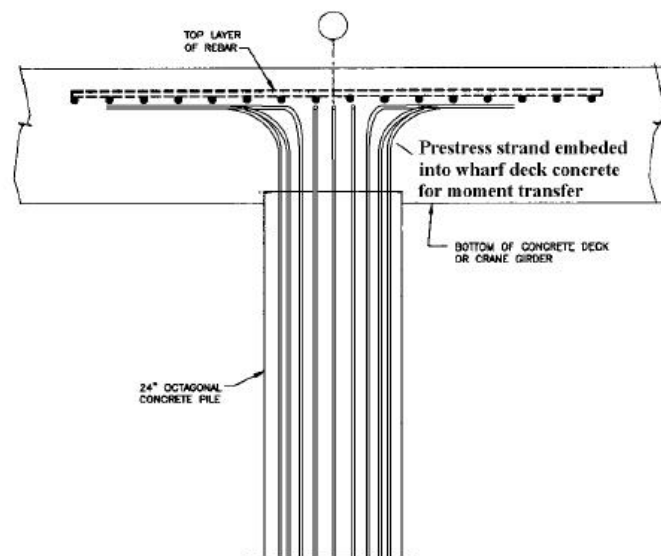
Typical prestressed concrete pile moment connections with extended strand connections (Roader, 2002)
